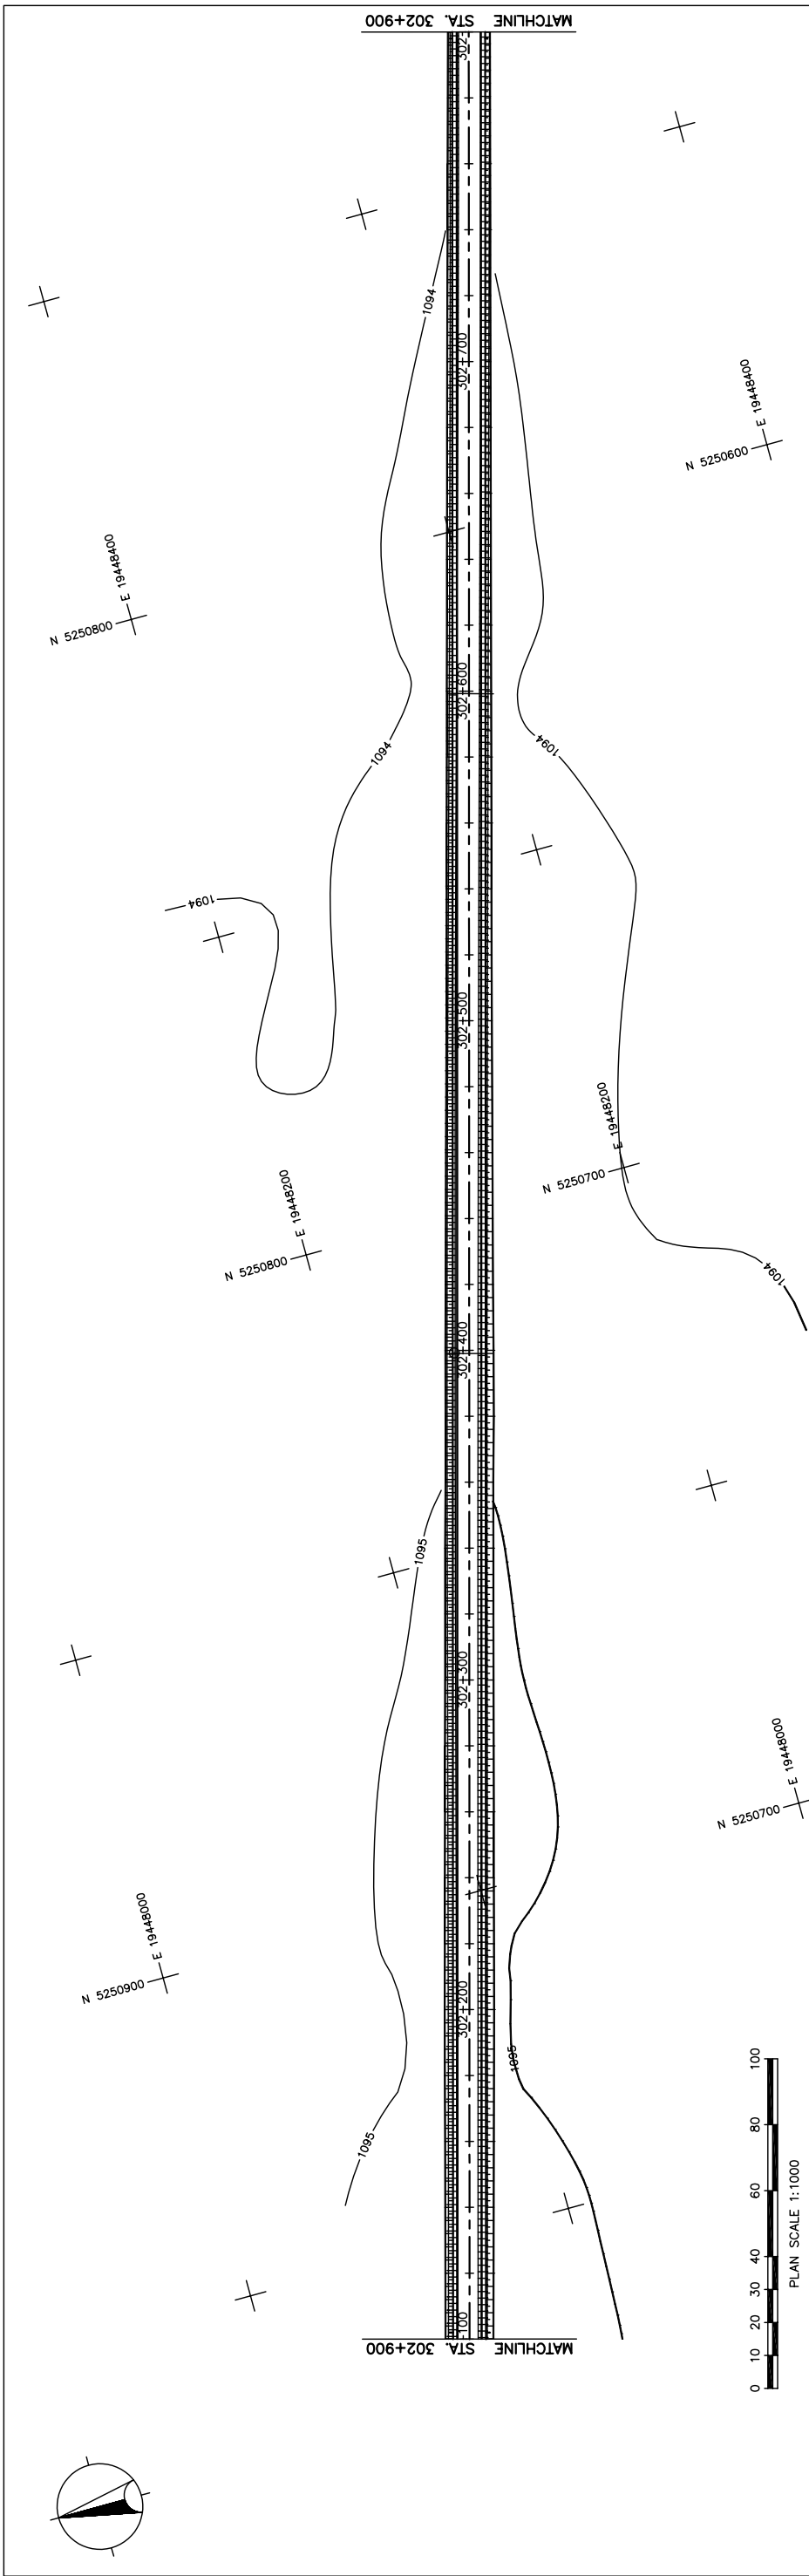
Plan and Profile (Section VI Sta.301+415.800-Sta.302+100)
